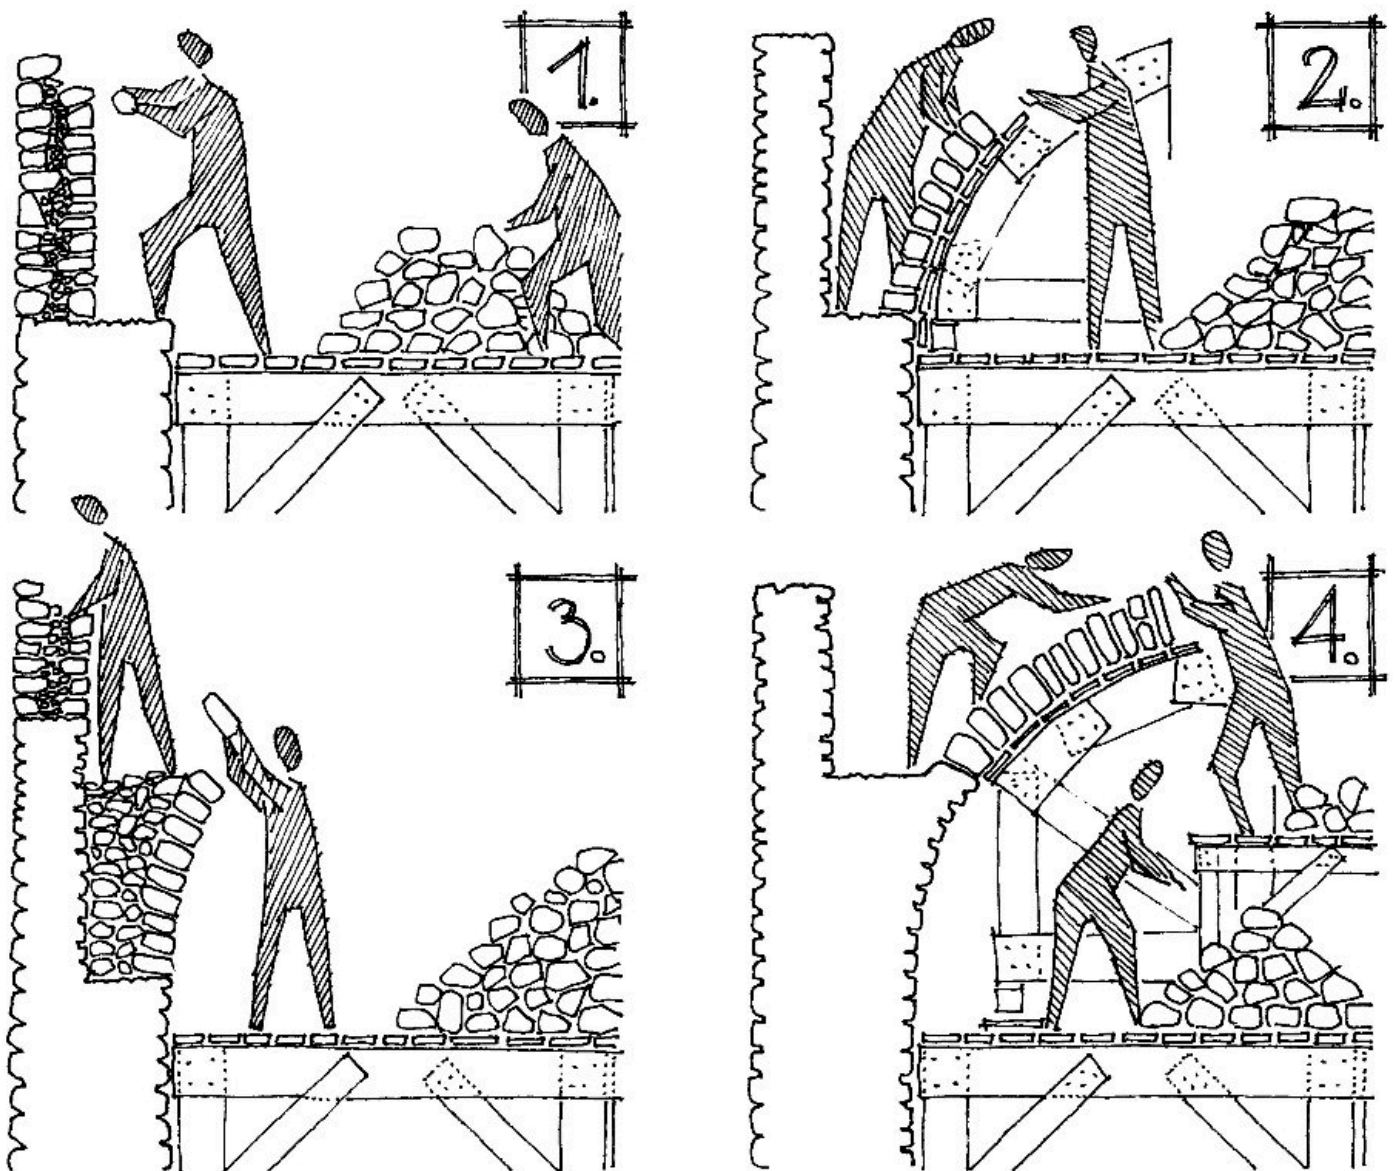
THE PROCESS OF BUILDING THE VAULTING OF THE NAVE. (1) BUILDING THE KNEE WALL (HALF WALL) FROM THE STAGE (2) BUILDING THE VAULT FROM THE STAGE. (3) KNEE WALL BUILDING FROM THE MANTLE WALLS FILLED WITH STONES. (4) BUILDING THE VAULT FROM THE MANTLE WALLS (FOR DETAILS SEE THE TEXT).
